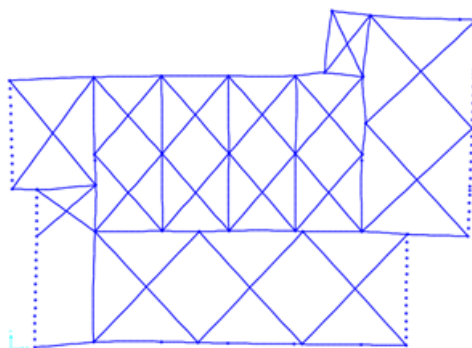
In-plan deformed shape of the strut model, under horizontal actions
